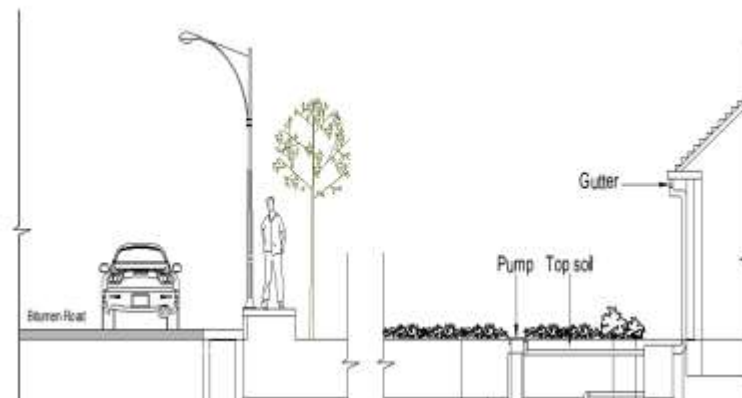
Schematic section showing detail of Rainwater harvesting pit at household.
